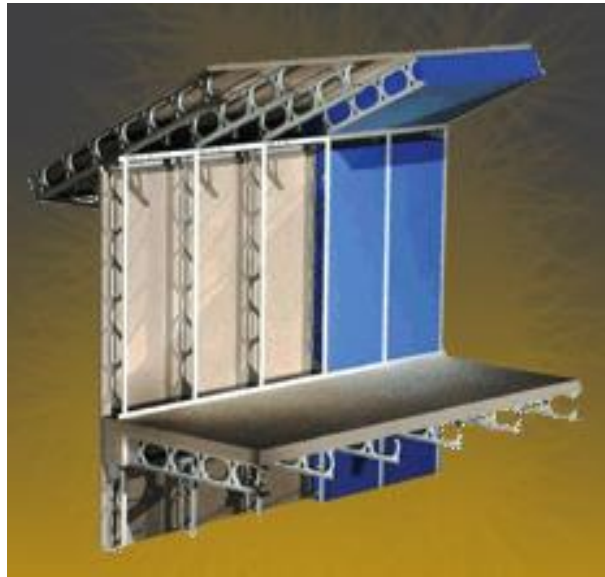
Thin shell precast panel applications (“About @ www.nexcon.ca,” 2011)
